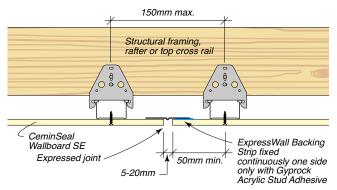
Framing and Sheet Module Control Joint -Expressed Joint – Alternative
